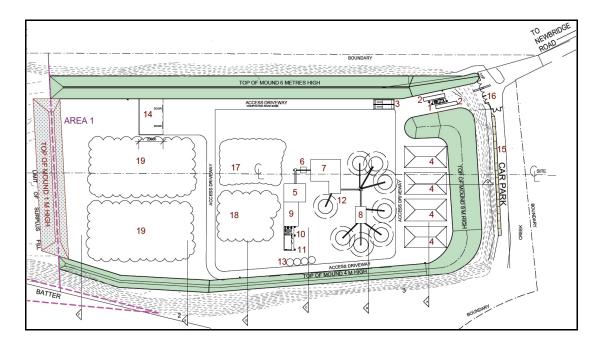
Extract from the revised Site Layout Plan. Numbers referred to in the plan are detailed in th discussion below.
